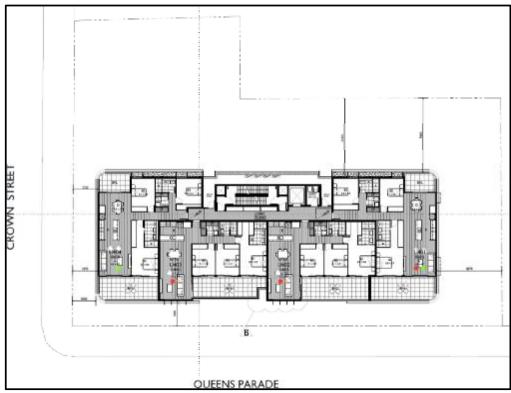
Typical Level 4 and 6 Floor Plan (\*Source: ADM)
